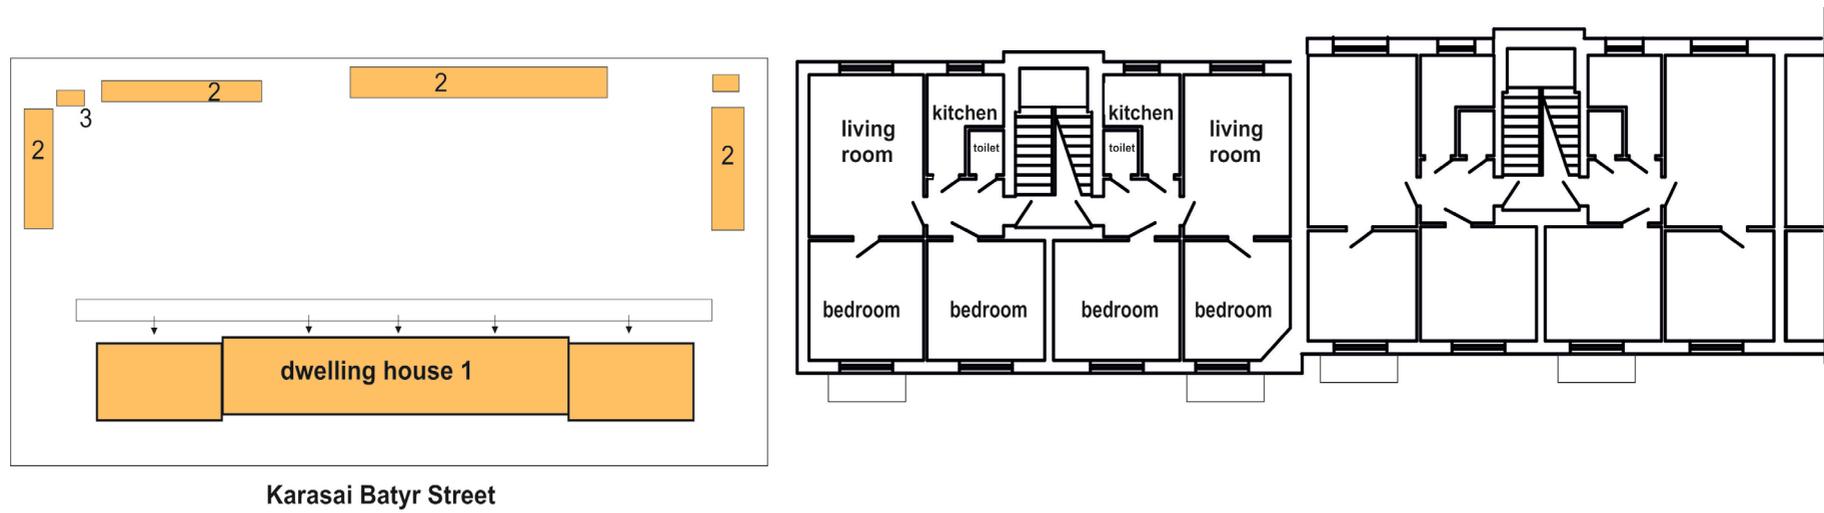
Model plan of a residential building (two sections of five) on Karasai Batyr Street (formerly Pervomaiskaya Street) 8 and 10 with a site plan. Source: State Enterprise Real Estate Center of Astana archive file 11815 (archived by the author A.D. Toishiyeva in 2014). 1 - dwelling house; 2 - household building; 3 - latrine.
